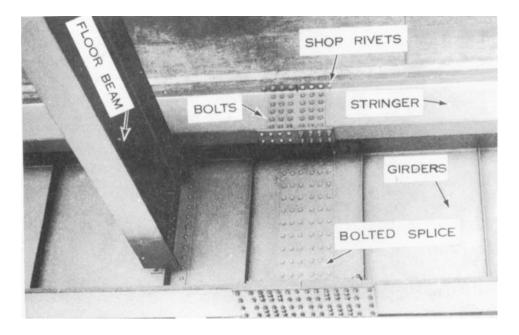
Typical floor systems. (Sheet 2 of 3)
